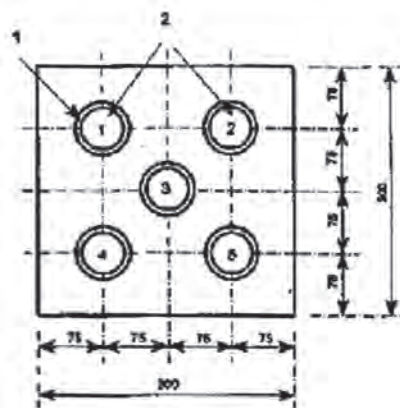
View of the sample for testing with the arrangement of the discs, dimensions in millimeters; 1 – ring around the test site, formed during drilling, 2 – steel or aluminum discs with a diameter of 50 mm [15]
